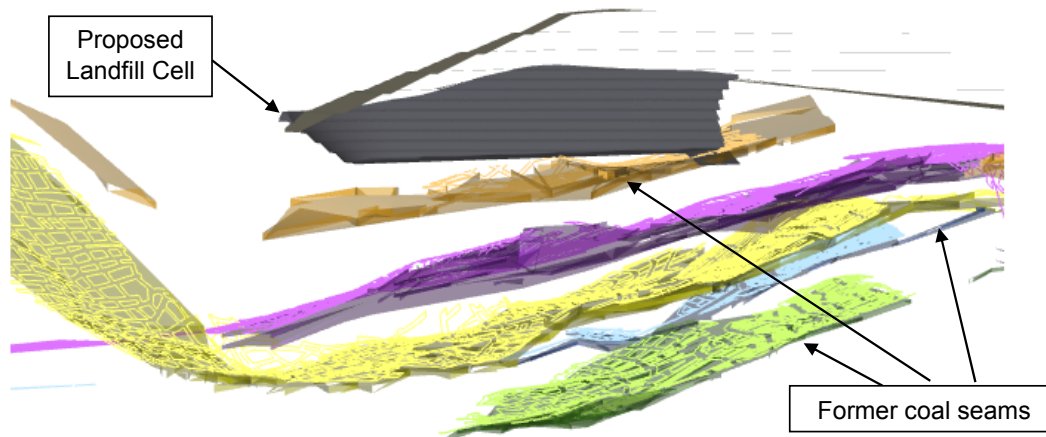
Cross-section of concept design and final profile (looking west) with underlying coal seams / workings
